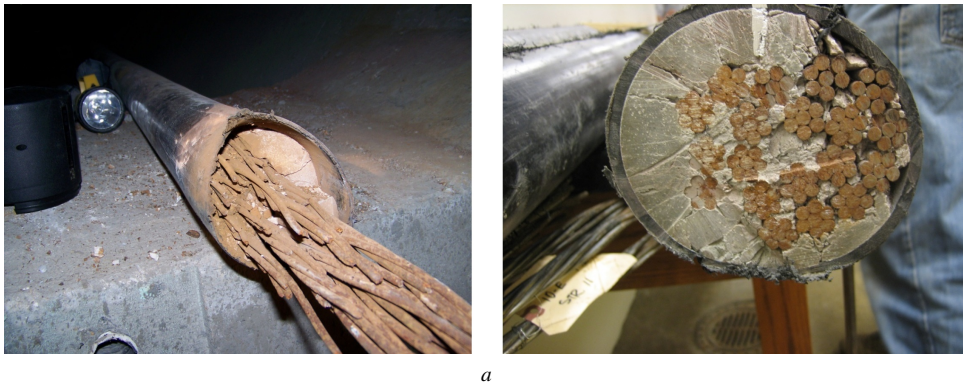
Example of corroded strands in the duct of post-tensioned bridge beam
